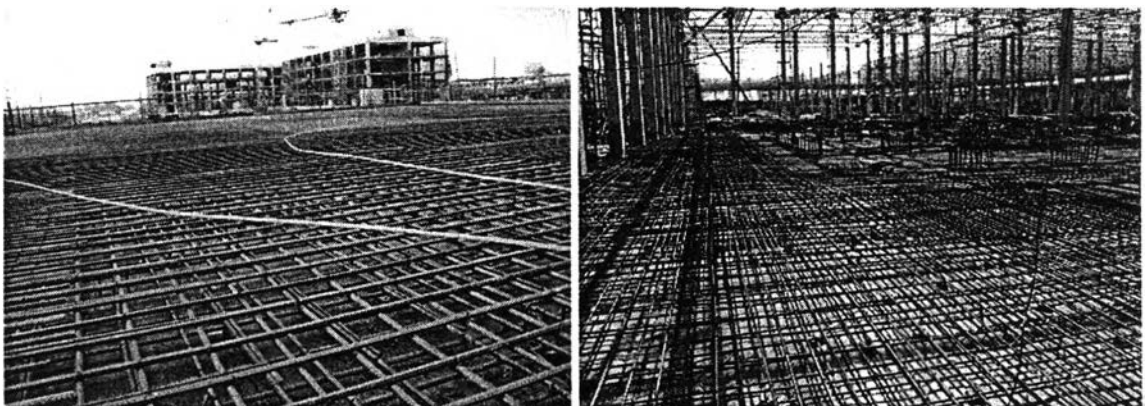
Steel fixing of slab obstructs concrete placing and roof-truss installation.
